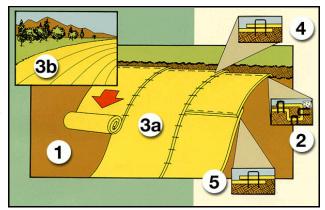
Erosion control mat slope installation example (North American Green, 2002).
